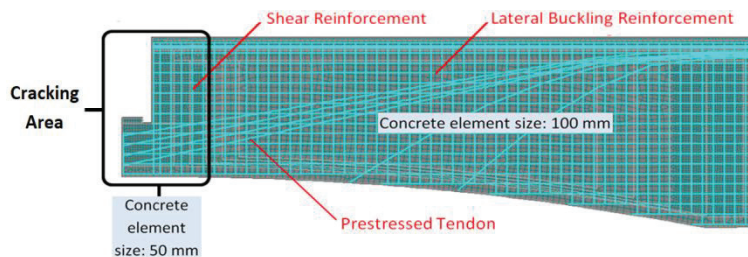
Detail of discrete reinforcement in analytical model and element size of concrete.
